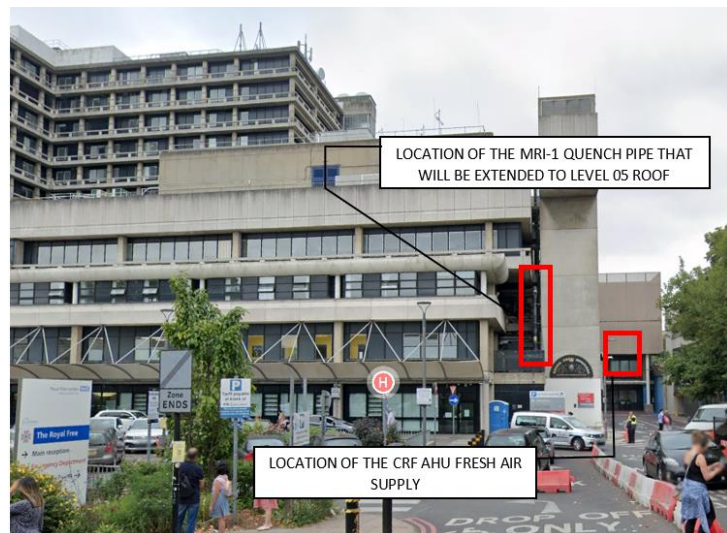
View of existing MRI-1 quench pipe and the proposed location of air supply for new CRF AHU unit
